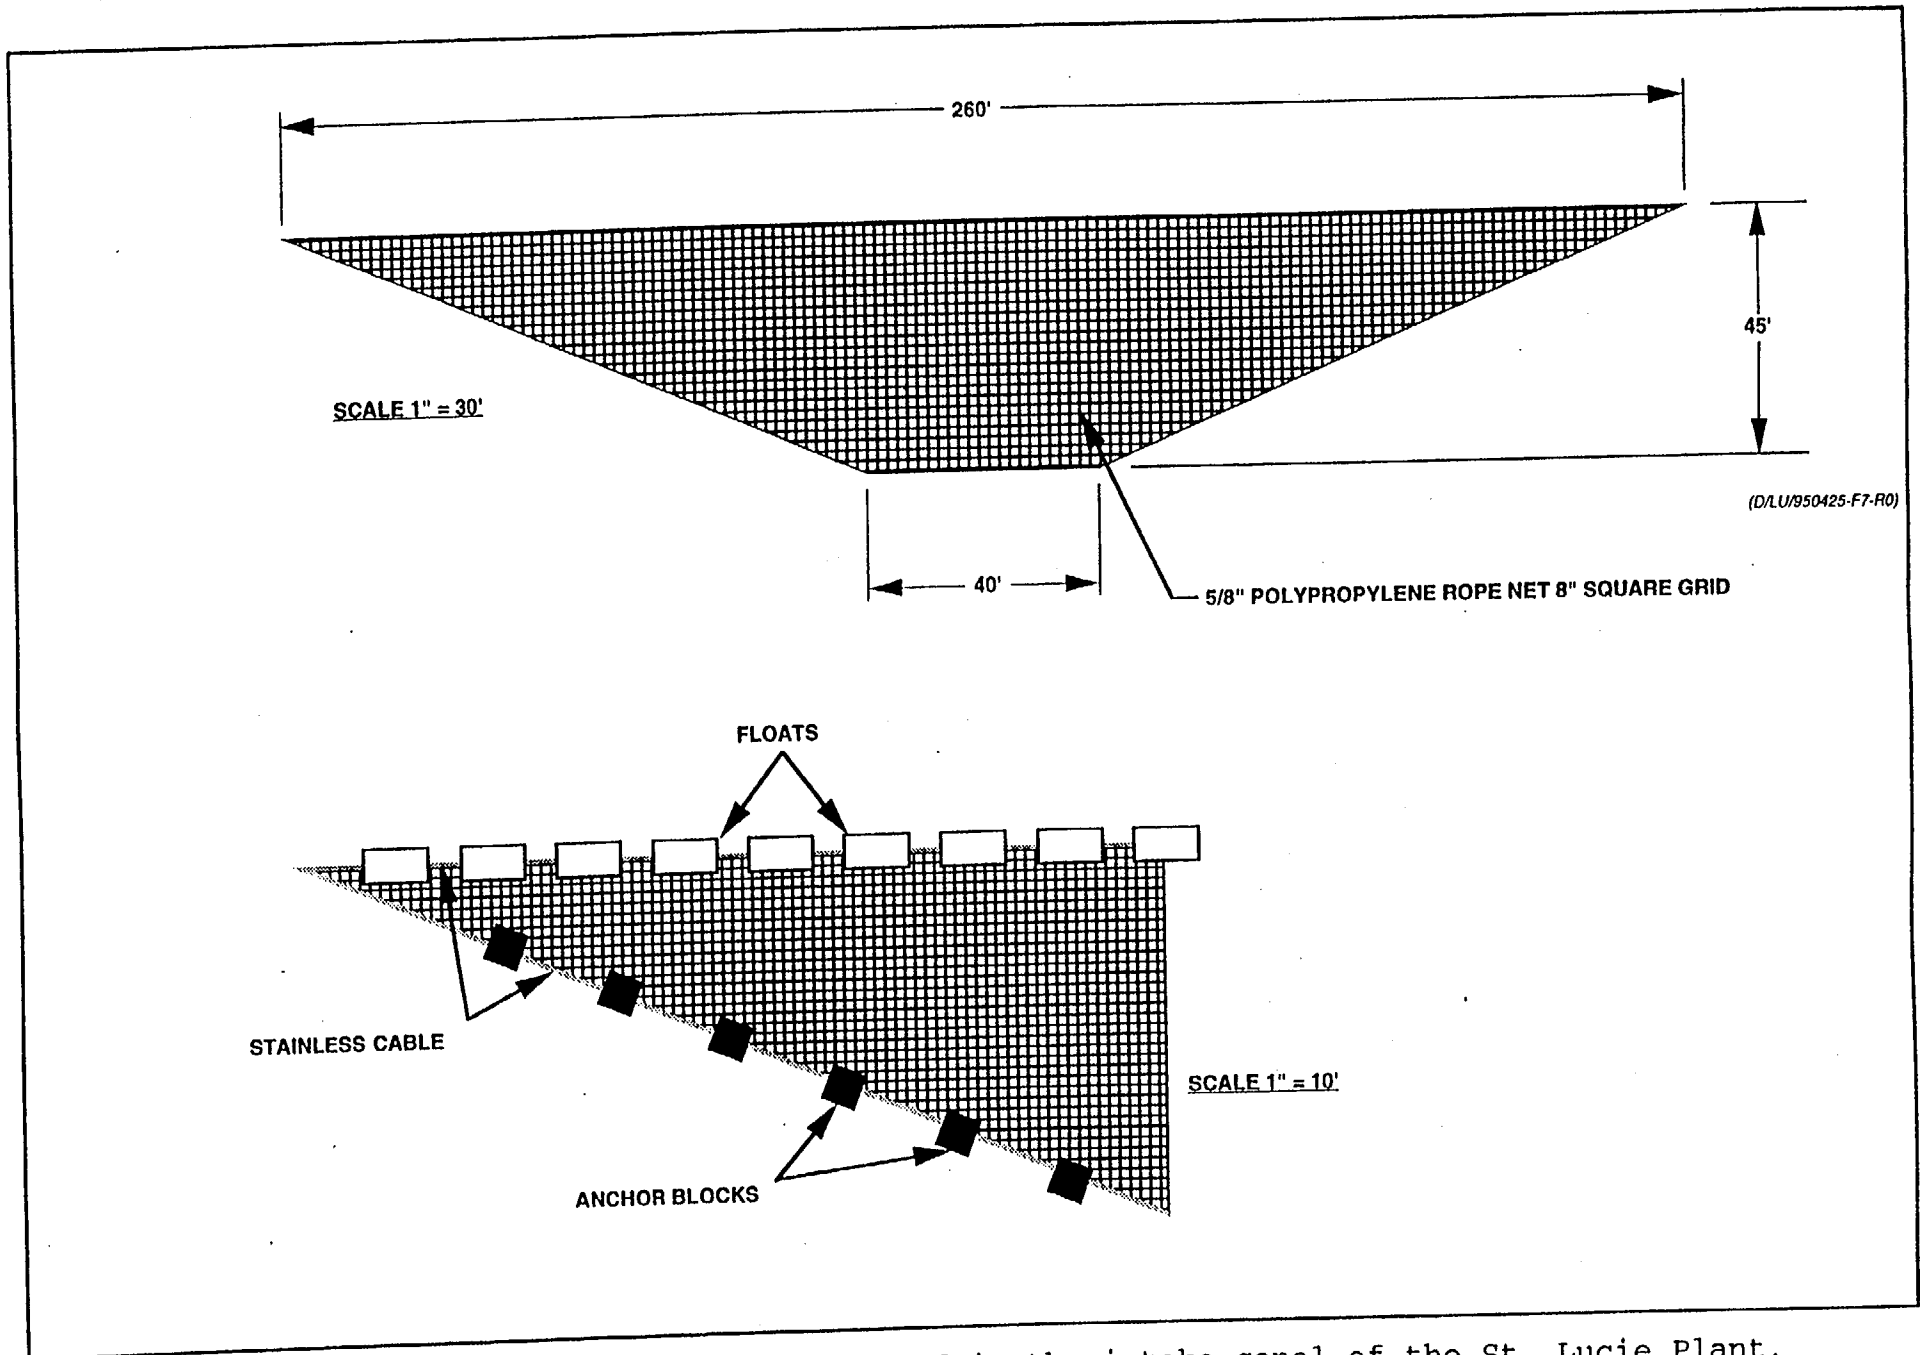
Diagram of the turtle barrier net used in the intake canal of the St. Lucie Plant. This net is located at the A1A bridge (see Figure 2)
